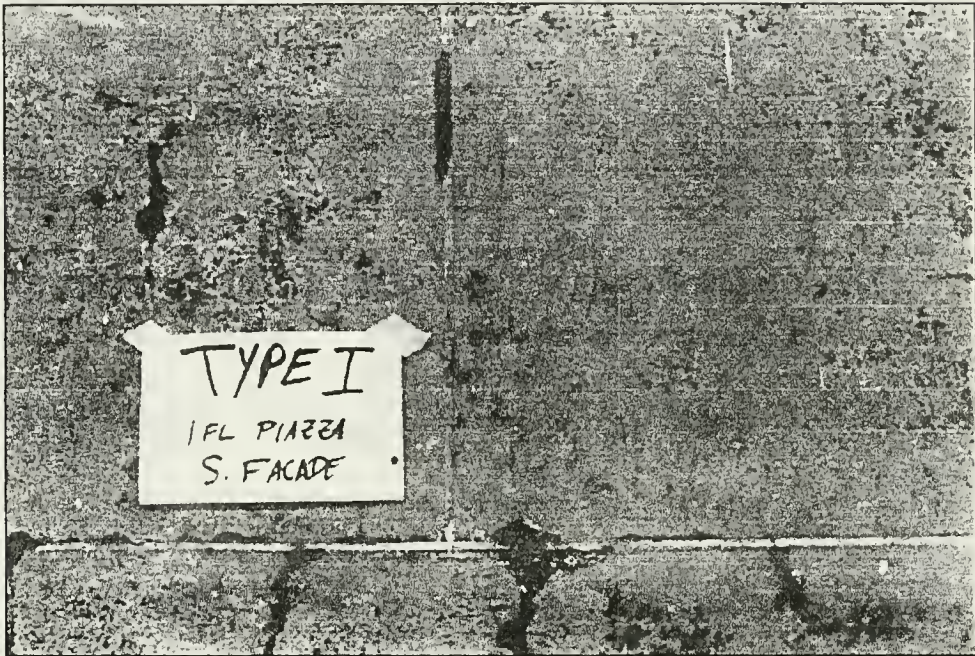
Example of stucco type 1, applied in the 1830s to cover repairs to brickwork. Protected areas retain most of their surface finishes including two layers of lime wash and scored joints. South facade, first floor piazza.
